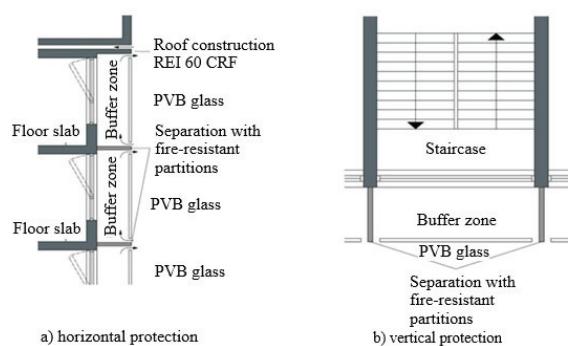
Horizontal (a) and vertical (b) protection in the use of laminated glass for a double facade
